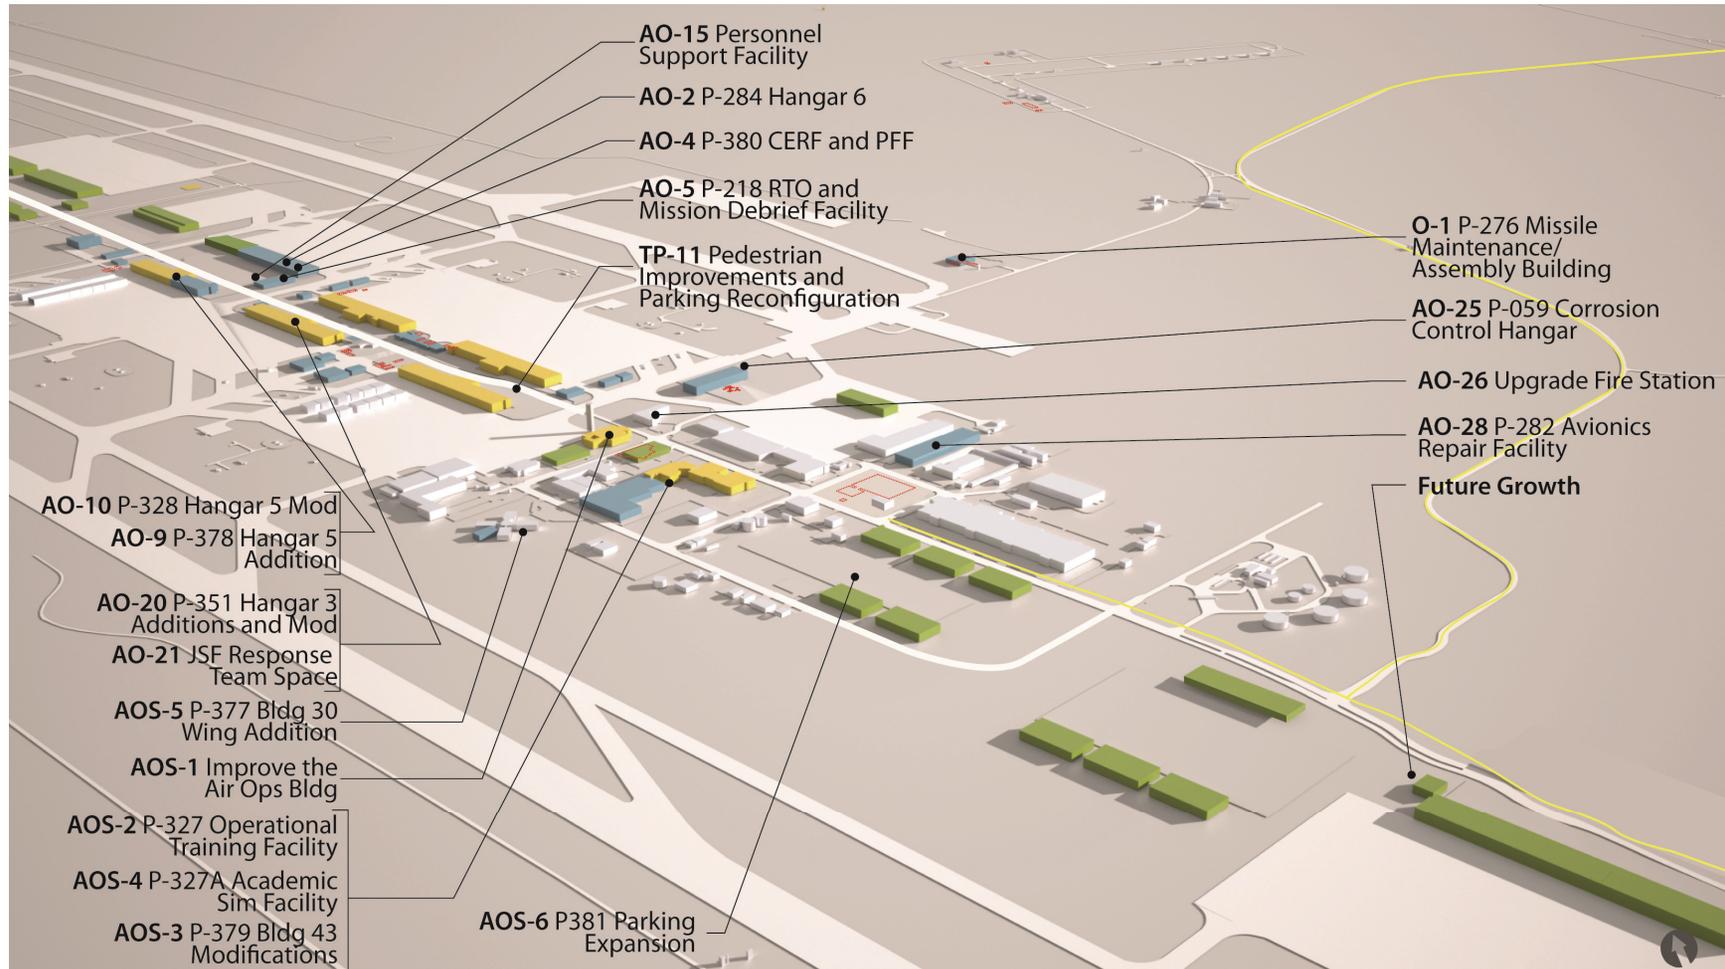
INSTALLATION IMPLEMENTATION PLAN (OPS SIDE)
